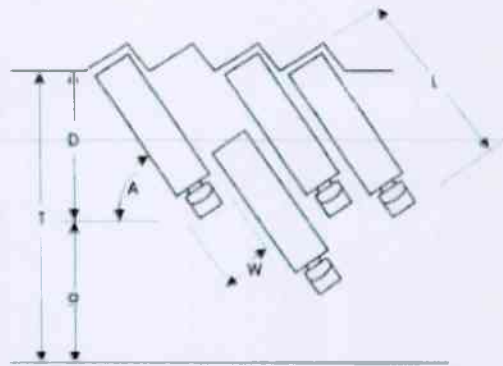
Minimum parking space dimensions and aisle widths.
